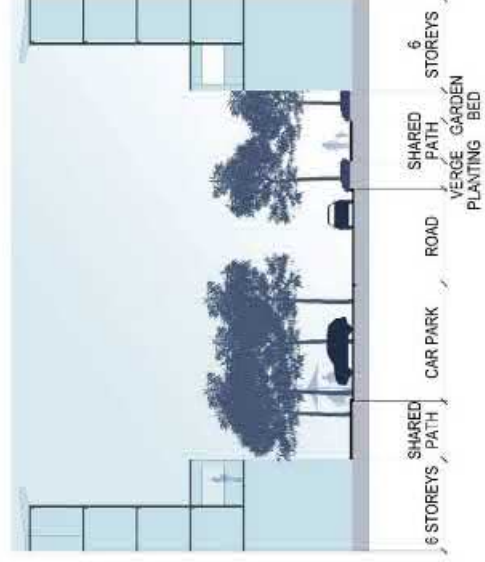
Daly Street Plan Extract and Indicative Cross-Section
